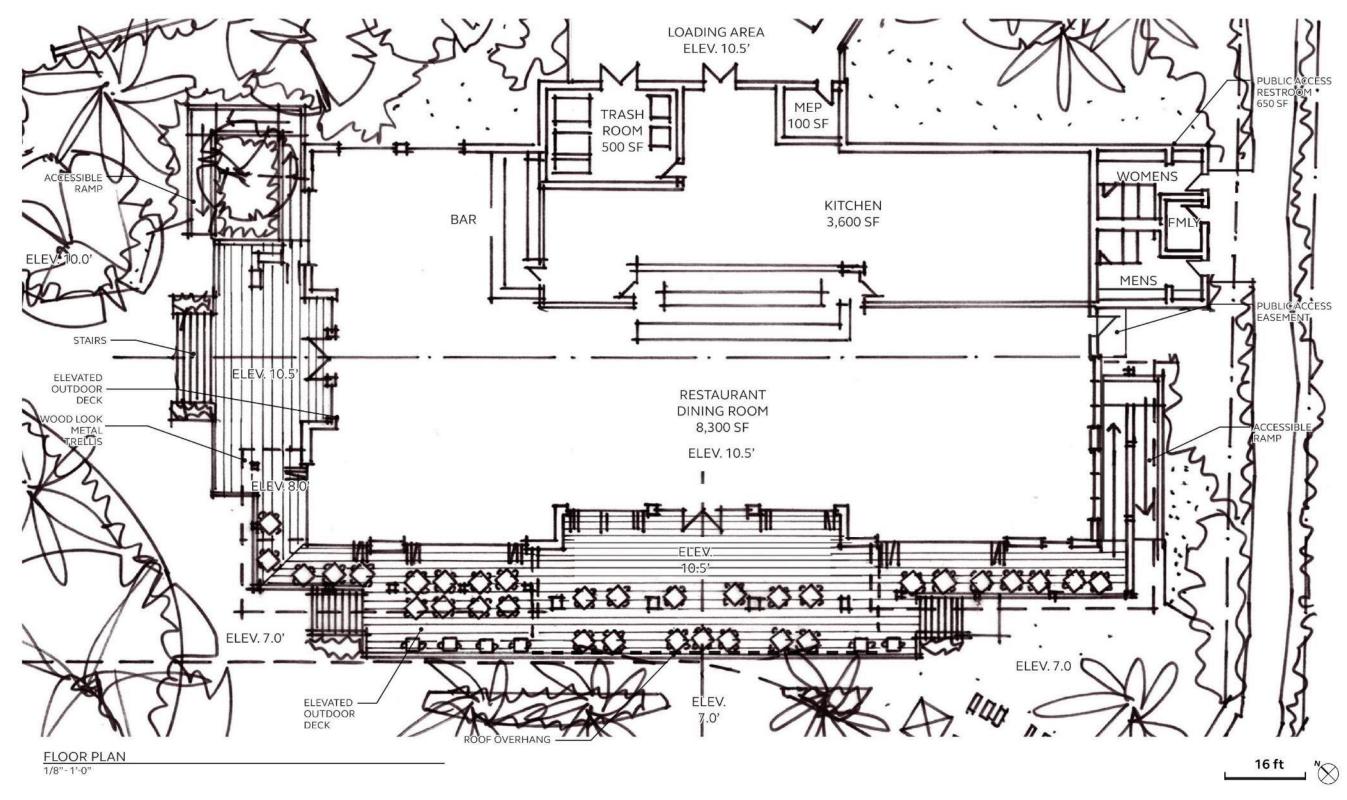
Restaurant Building 1 – Preliminary Plan
